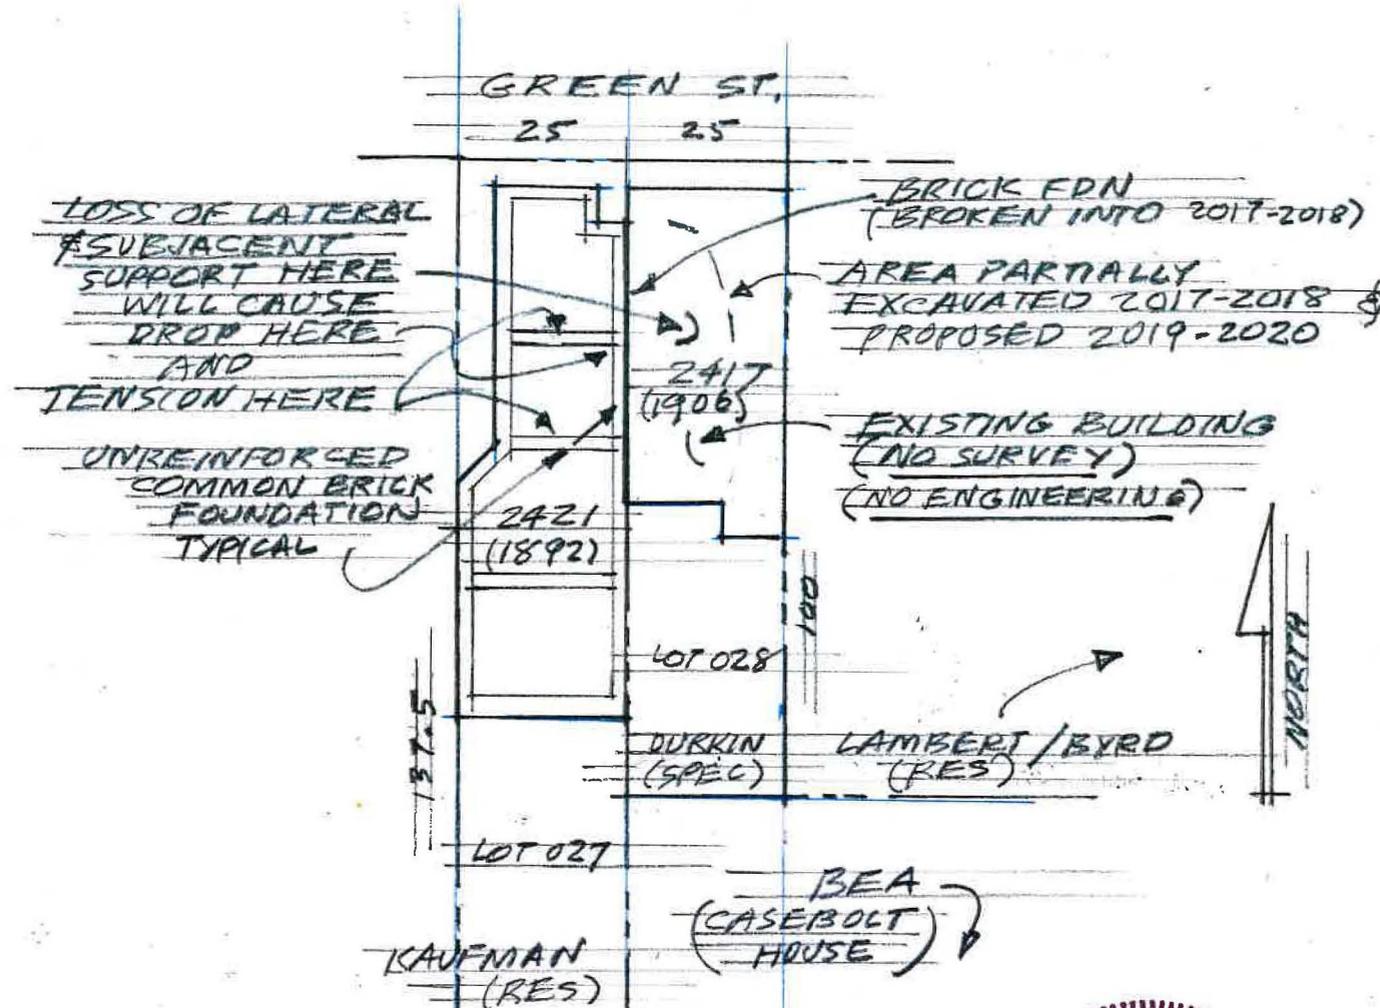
Detail 3 on Sheet S4.1 of Building Permit Application No. 201705116316
